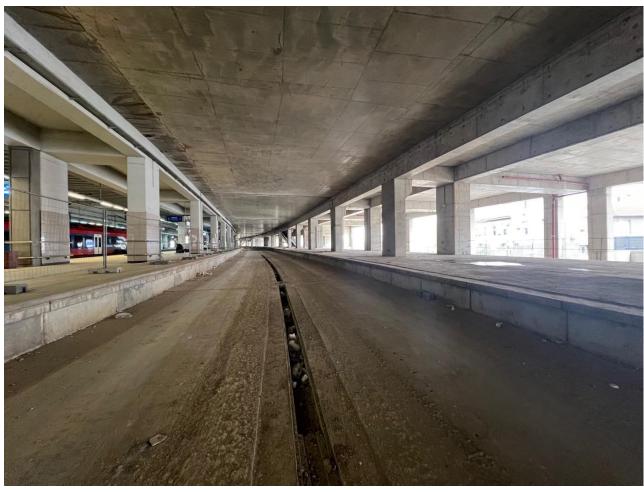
Below the Prokop station ground floor - platform on which finishing works will be carried out and railway tracks where new rails will be placed as part of the SRSM subcomponent project
